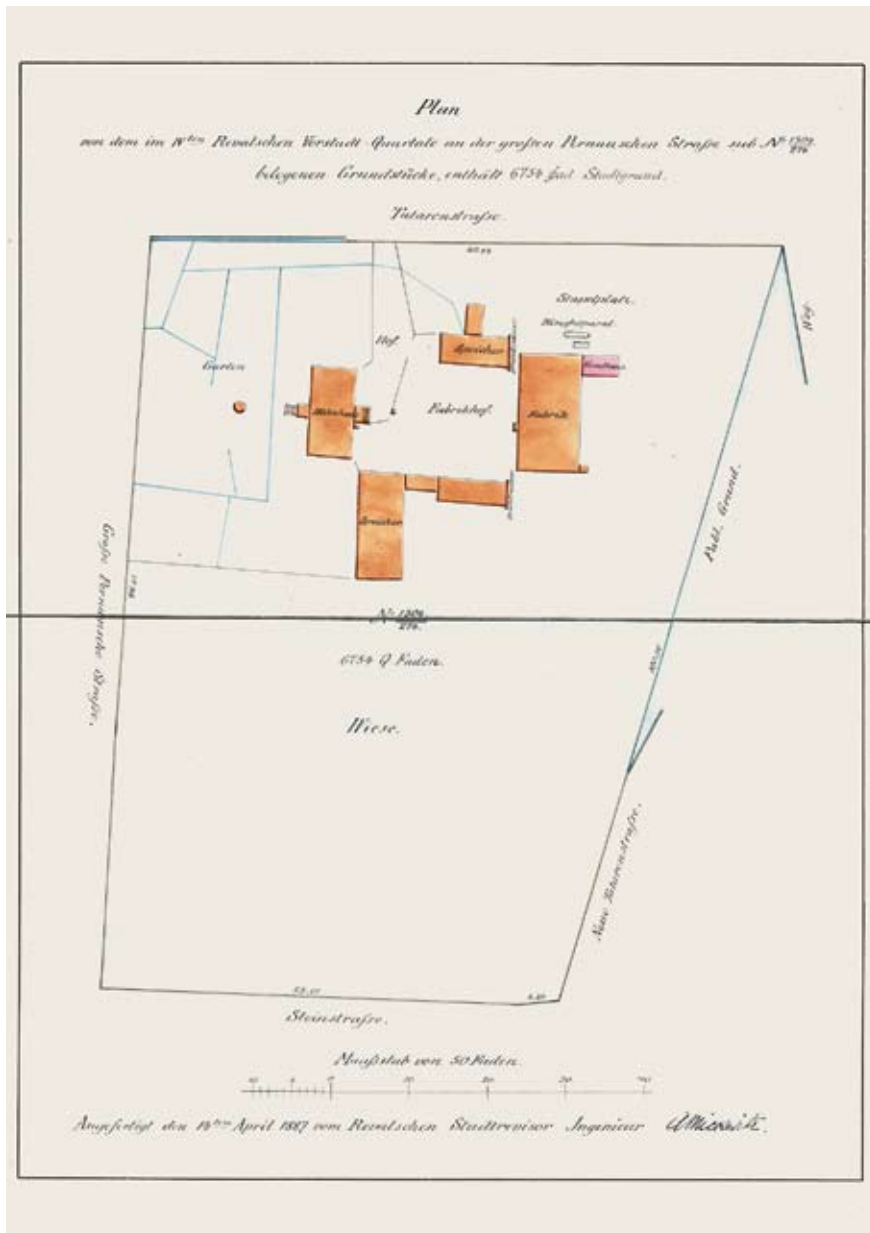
A groundplan of a wallpaper factory in a villa belonging to Baron Arthur Girard de Soucanton. EAA 4924.1.4124.
